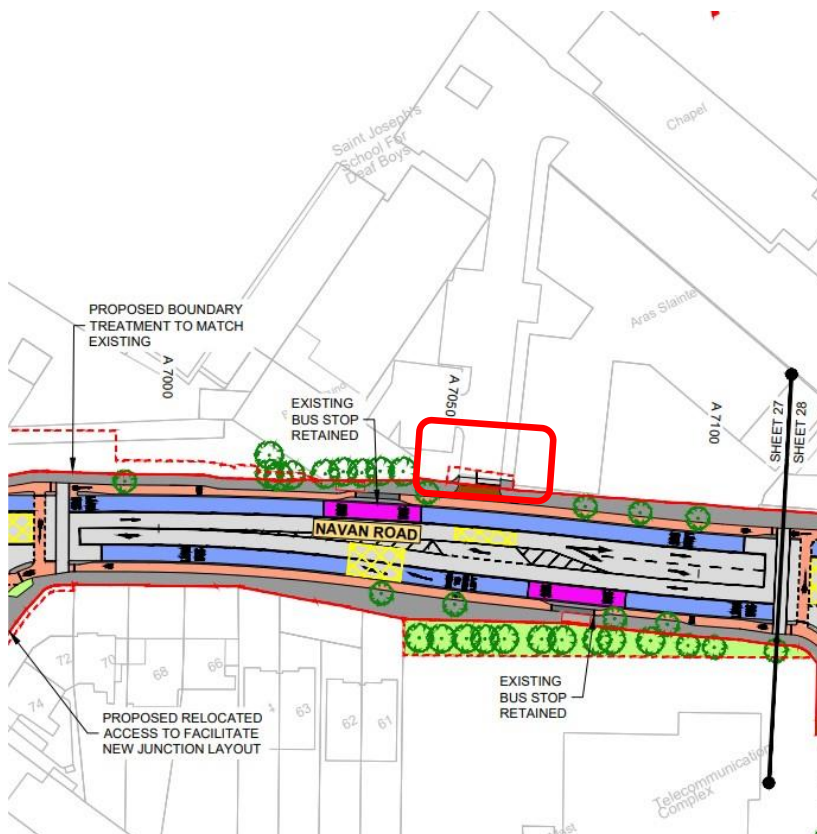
Proposed new Layout at Aras Slainte, Navan Road
